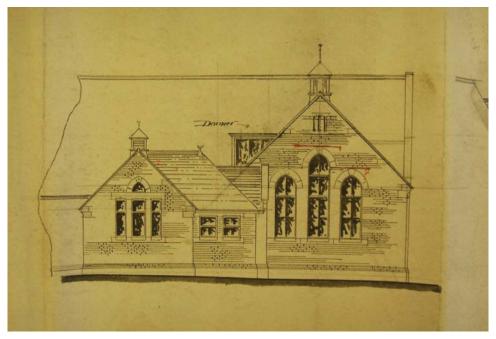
South-west elevation of the proposed additions at the south-west end of the building, 1891 (CRO(B) Z1041 1875-1904)
